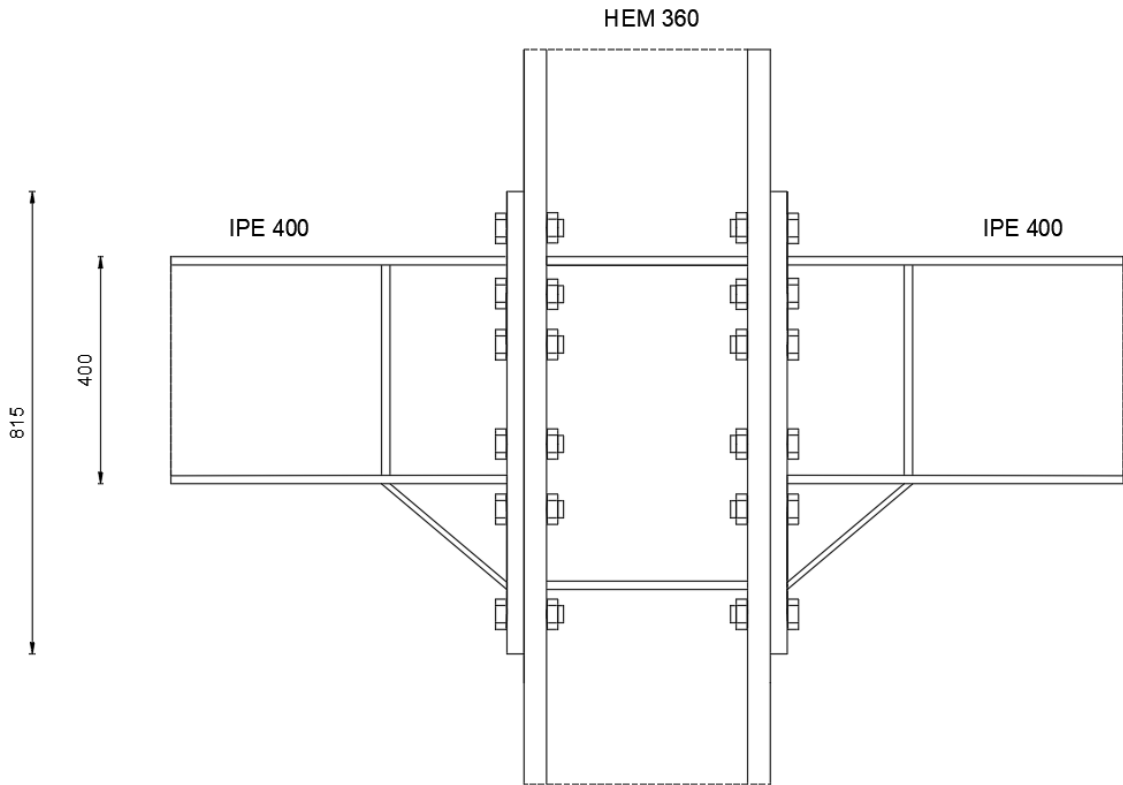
Double-side joint configuration of haunched connection of beam IPE 400
